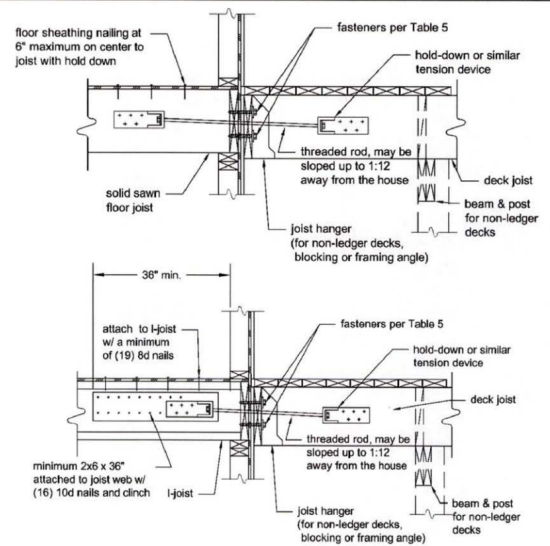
Lateral Load Device with Floor Joists Perpendicular to Deck Joists.
